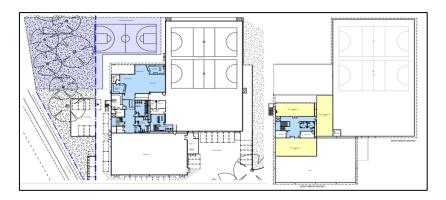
Proposed use of existing building – ground floor amenities, office and canteen shaded light blue, outdoor space shaded dark blue and first floor indoor play rooms shaded yellow with associated first floor amenities shaded light blue (Nimbus Architecture + Heritage)
